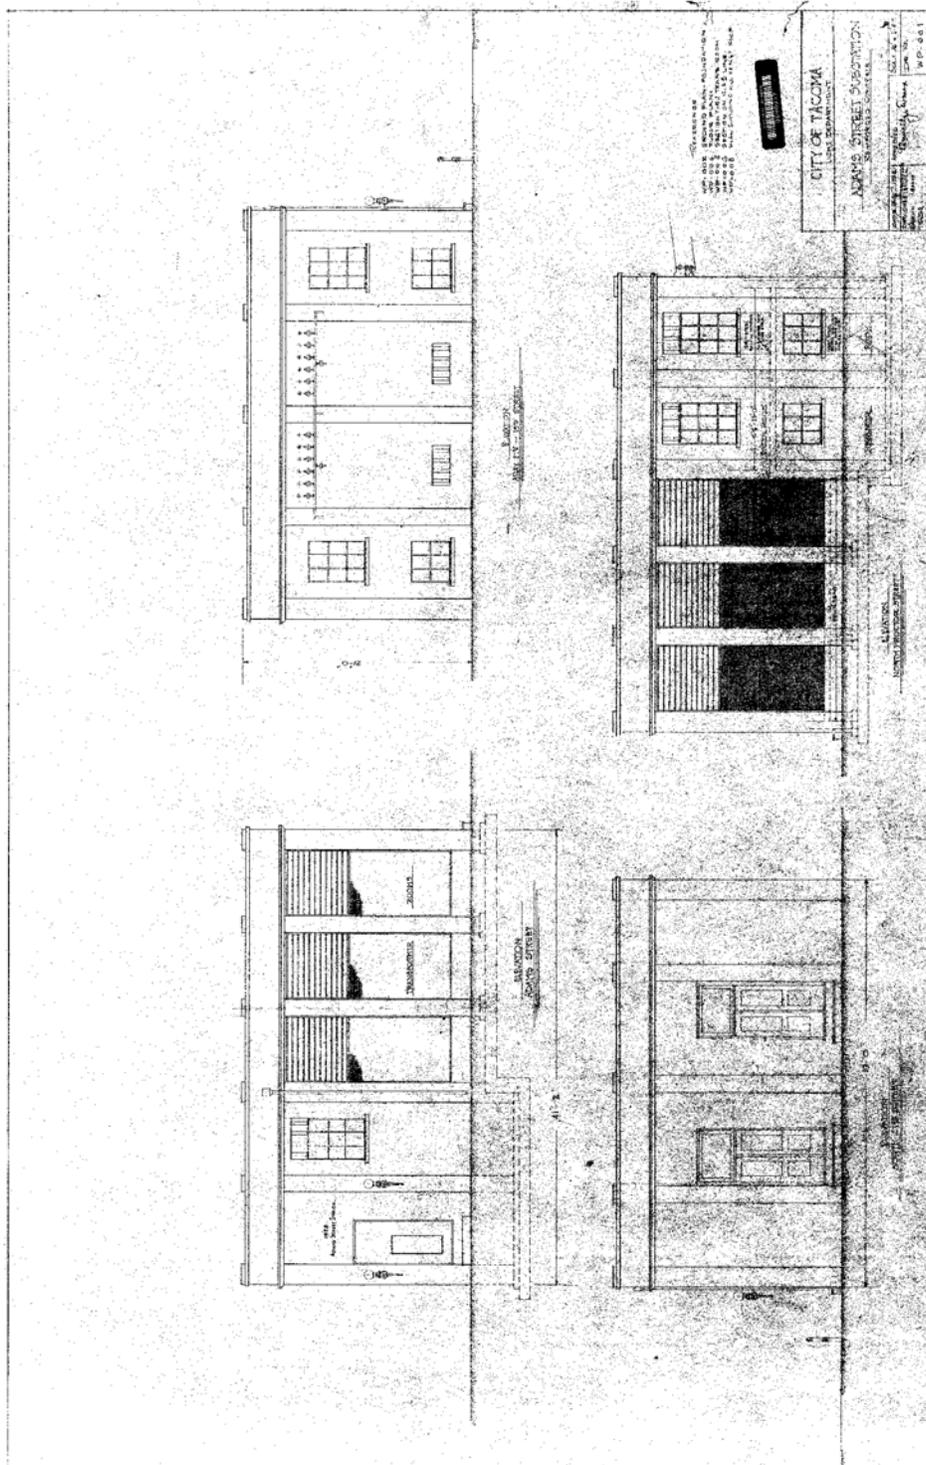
Adams Street Substation Plan 1924, Drawing courtesy of Tacoma Power
